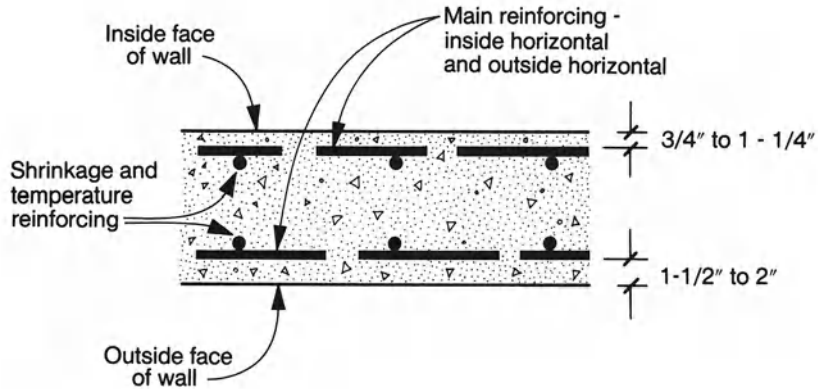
Typical wall reinforcing, for horizontal design.
